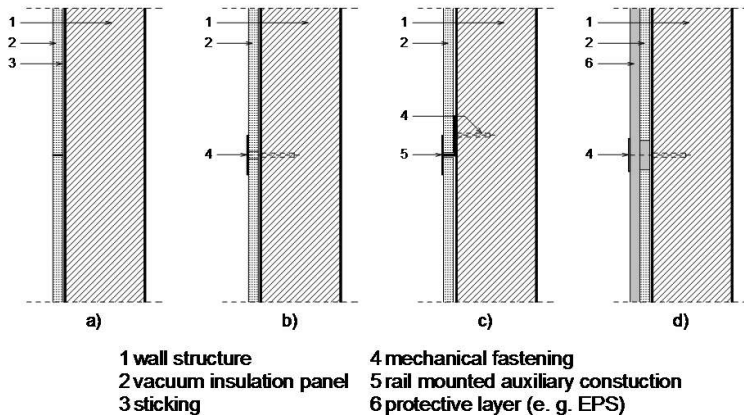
Fixing methods of vacuum insulation panels on façade walls (self-made drawing)
